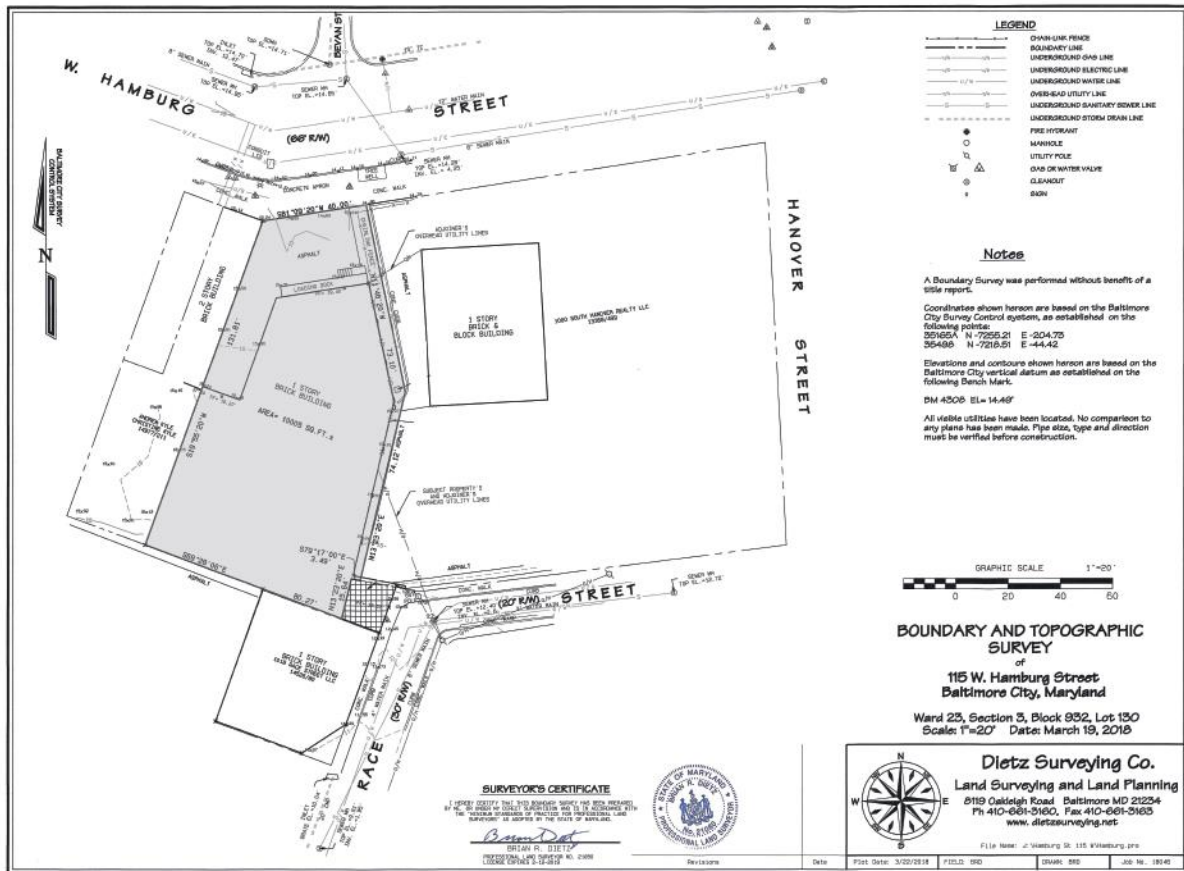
115 W. Hamburg Street – Property Survey in gray shaded area, March 19, 2018. Area with hash marks is encroachment on road bed, per applicant, being studied by civil engineers and legal team.
